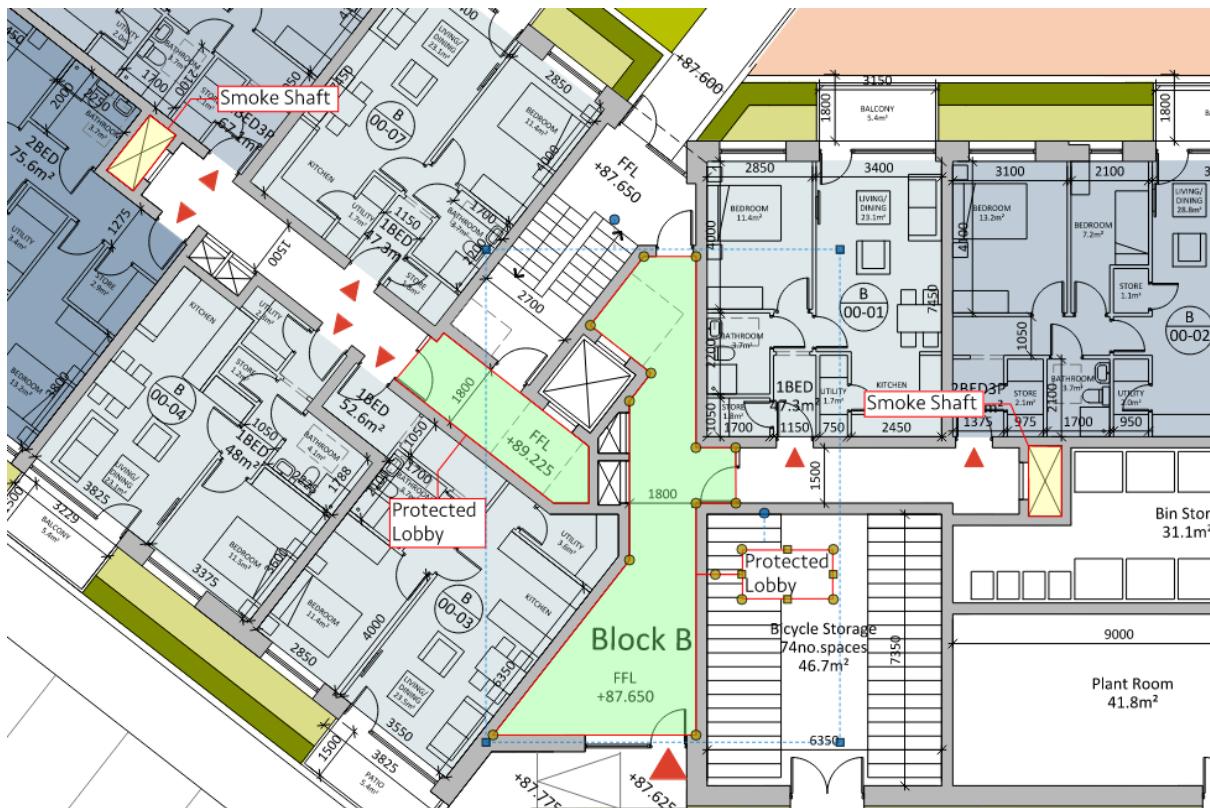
Ground floor layout showing smoke shafts and protected lobby to stairway.
